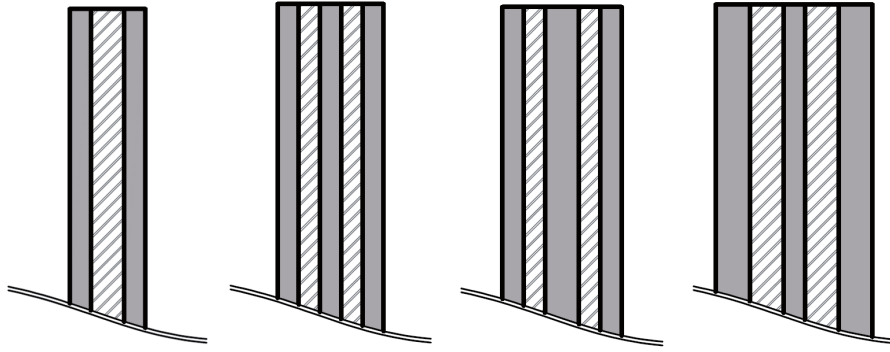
Wall types from left to right: Wall type 61, 85, 95 and slab 125.
